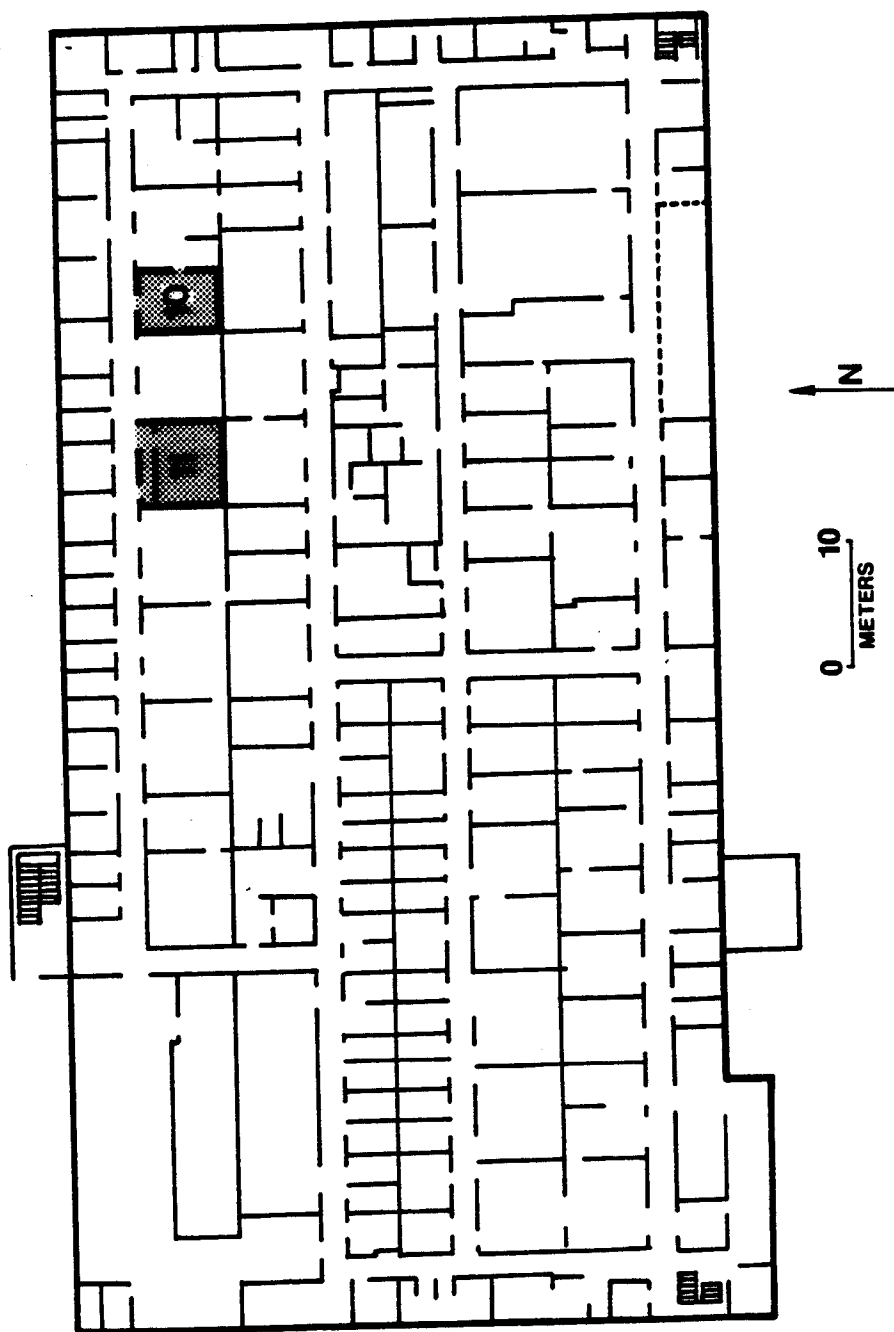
Building 004 First Floor Plan Indicating Location of the Emission Spectrometer Lab (10) and the X-ray Diffraction Lab (11).
